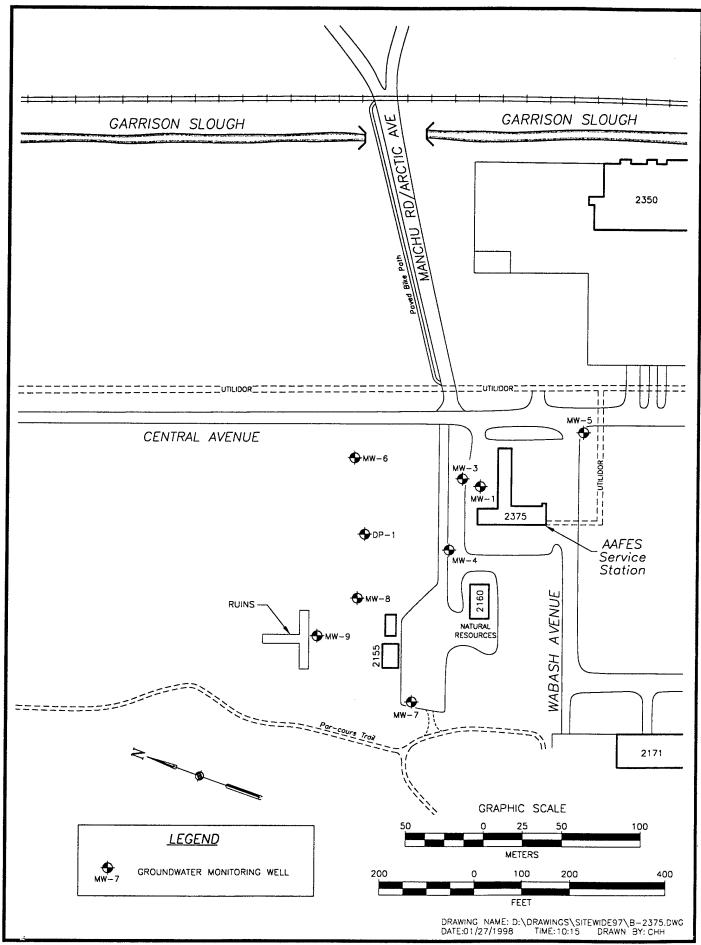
Building 2375 Site Plan Showing Locations of Groundwater Monitor Wells, Eielson AFB, Alaska
